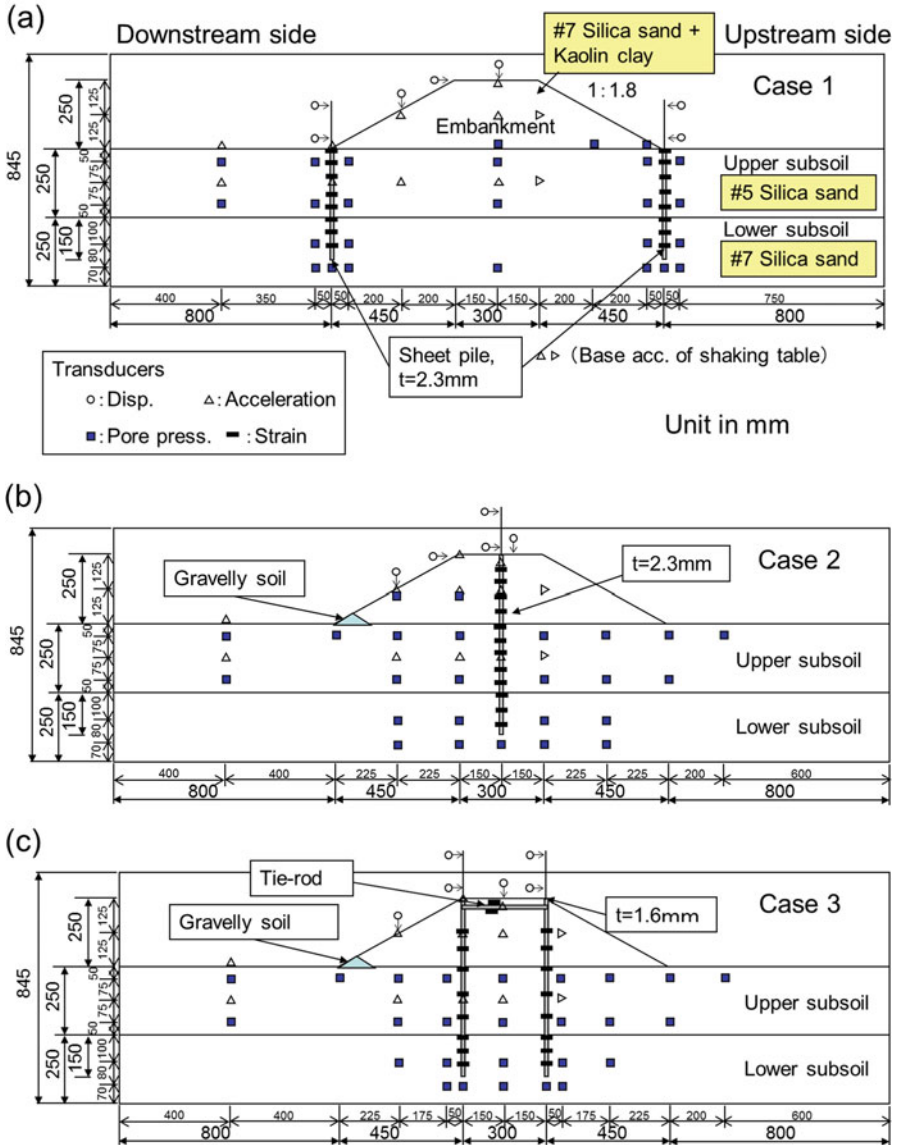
Cross-section of models for first series of shaking tests (Koseki et al. 2010). (a) Case 1 with a pair of sheet piles at the front of embankment. (b) Case 2 with a single of sheet pile at the crest of embankment. (c) Case 3 with a pair of sheet piles at the shoulder of embankment that were connected by tie-rods
